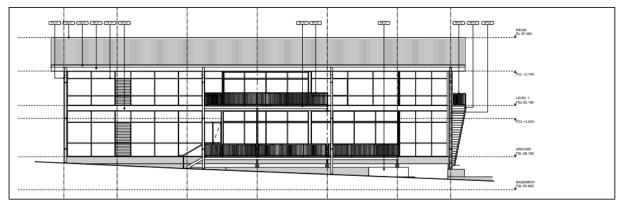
| Eastern elevation fronting The Avenue (Source: Applicant's EIS)
